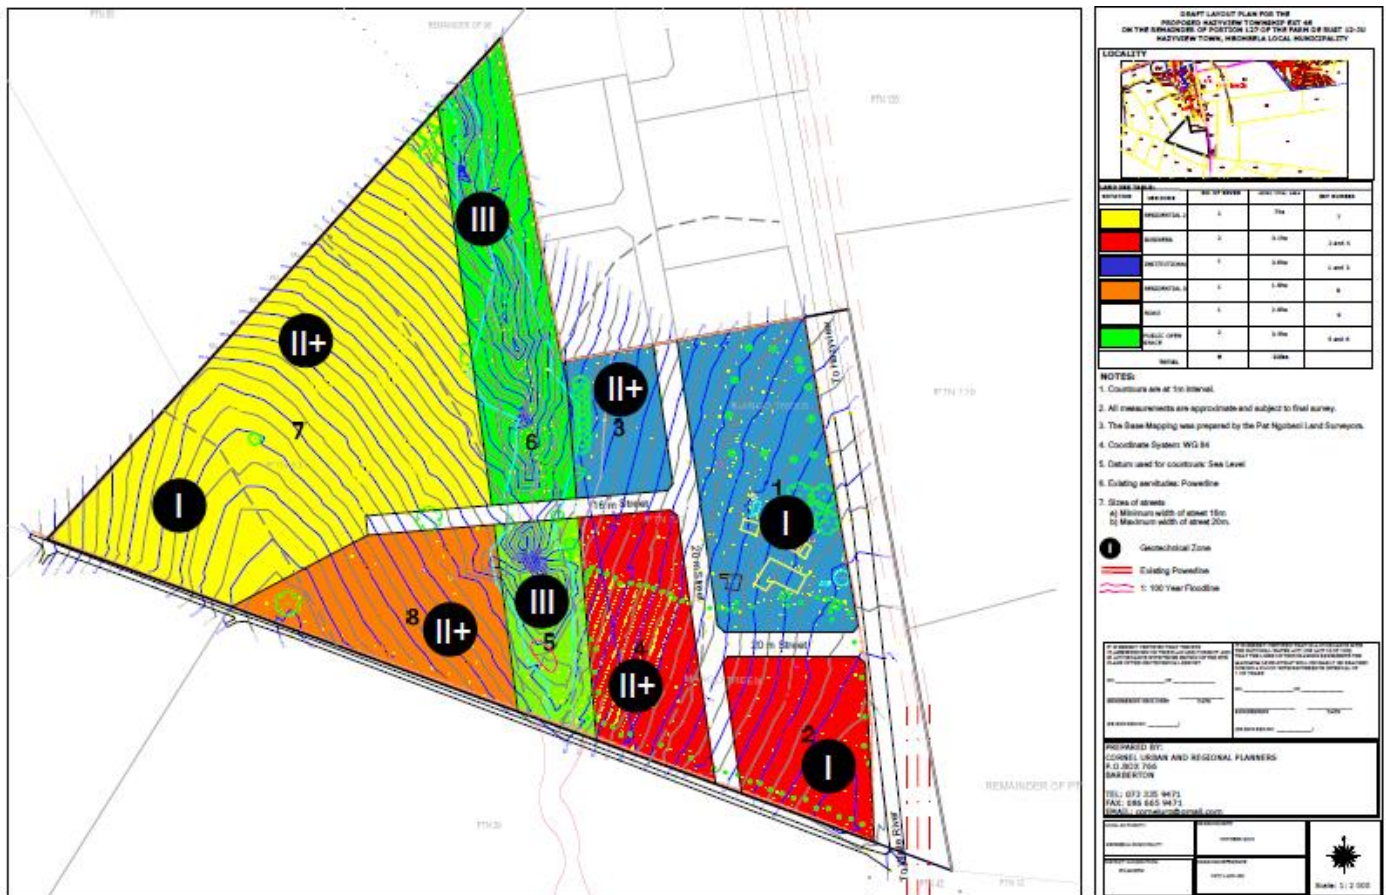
Layout plan of the proposed development area for the township establishment, Hazyview.
